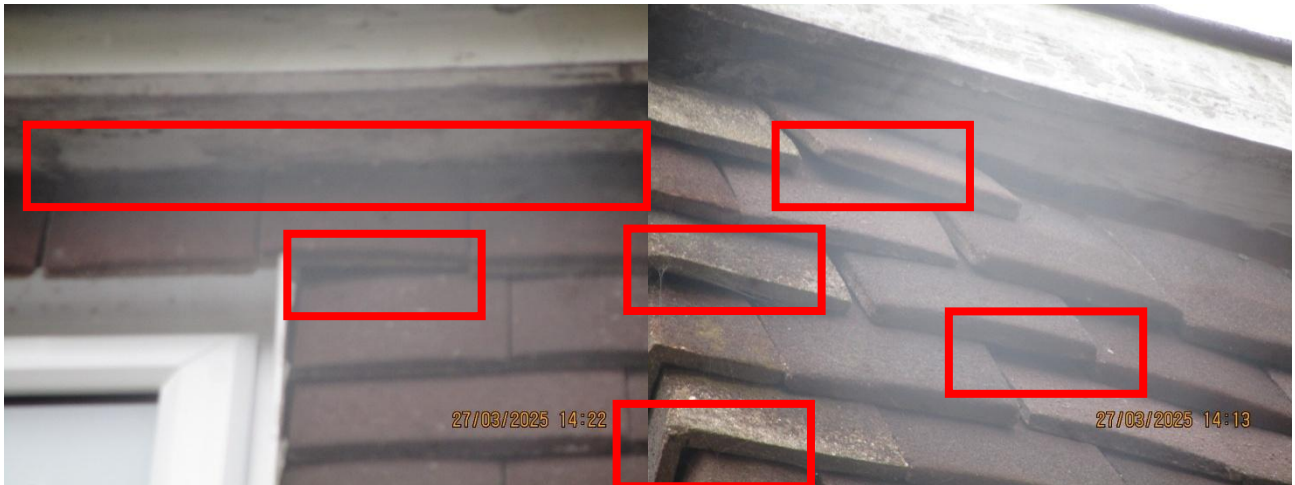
Gaps under lead flashing, and Photo 6 – Hole in soffit box
